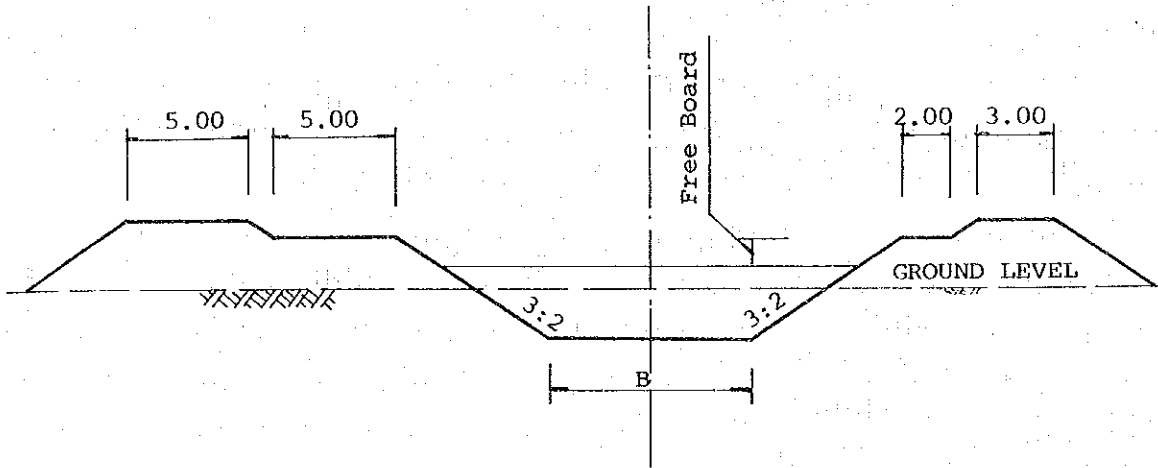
Typical Cross Section for Irrigation Canal
